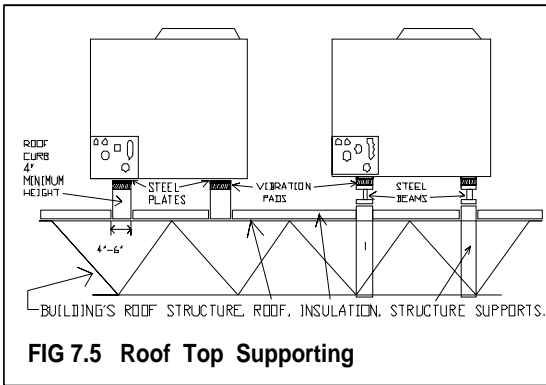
highlights some installation concerns for roof curb and steel rail structures. As with all chiller installations, the piping will soon be connected. Very important, chiller leveling starts with a level supporting mechanism (concrete pad, roof curb, etc.), then check a chillers level with a level (shim as needed, maximum 1/4" total) and then, start piping.
